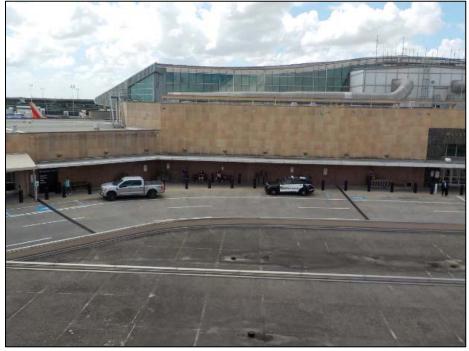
View of the HOU Main Terminal Building at passenger drop off (Level 2), facing south.
